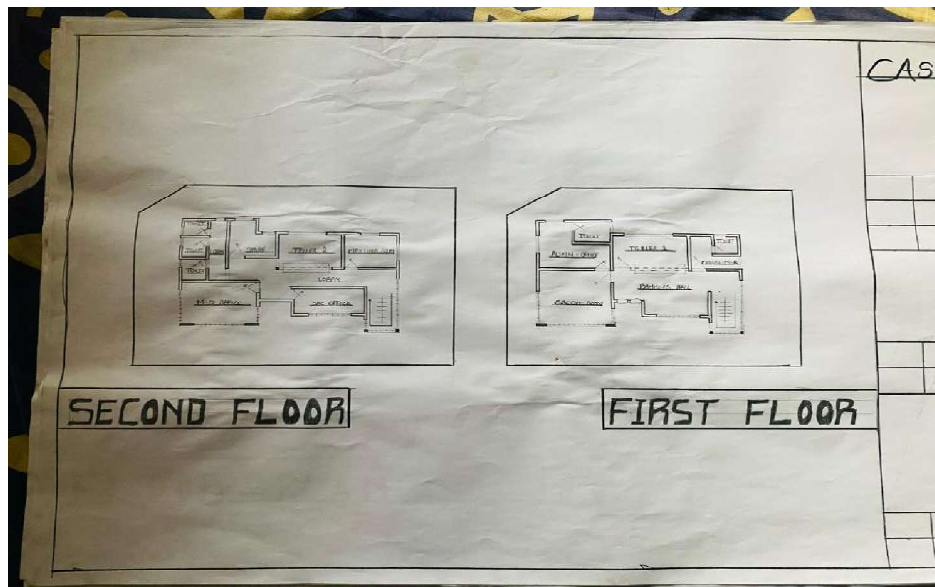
SHOWING THE FLOOR PLANS OF CASE STUDY TWO
